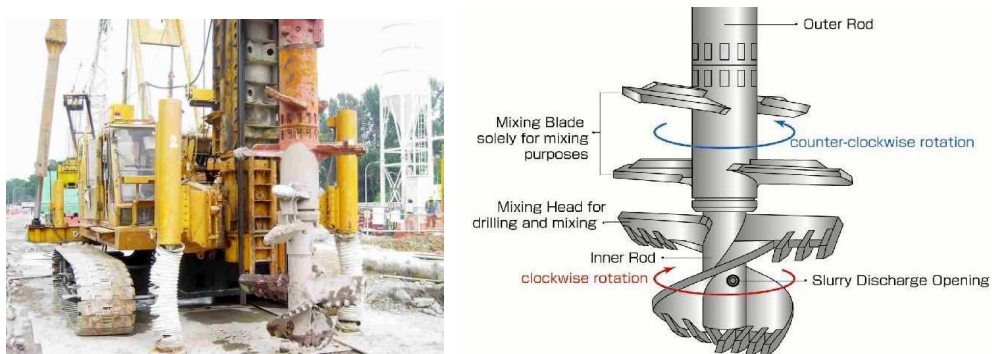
Jet mechanical mixing (JMM) machine and the drilling rod and mixing blades (after Osborne and Ng 2008)
